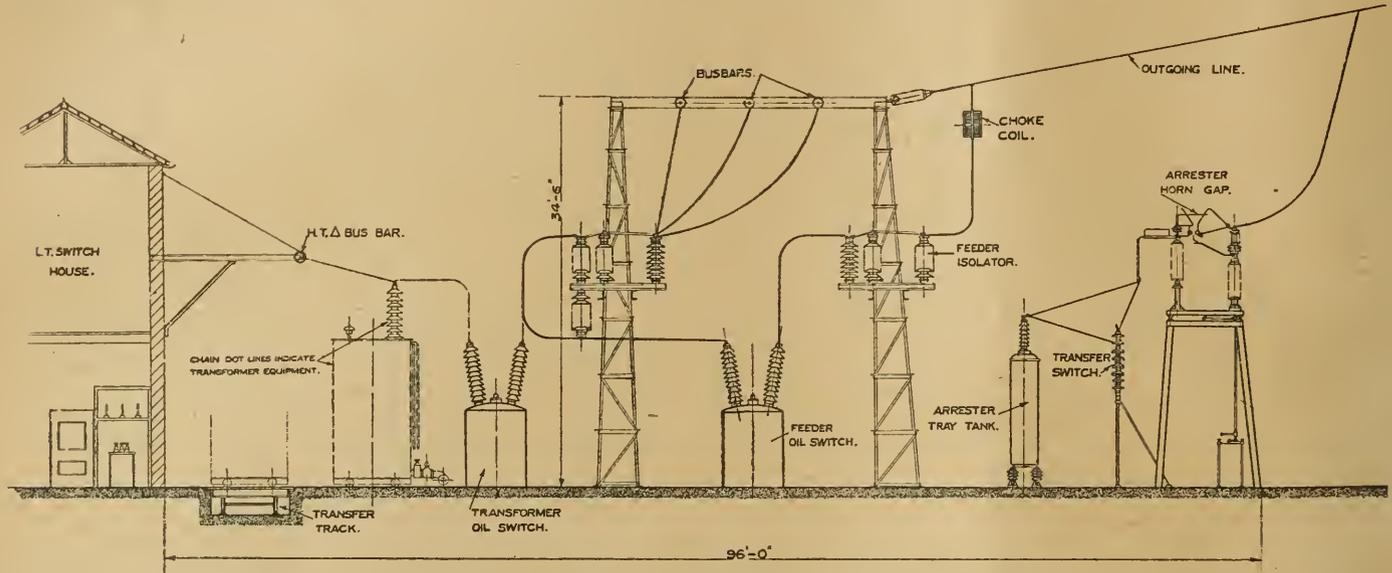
TYPICAL LAY-OUT OF 100 000 V OUTDOOR SUB-STATION. (SCHEME I.)
